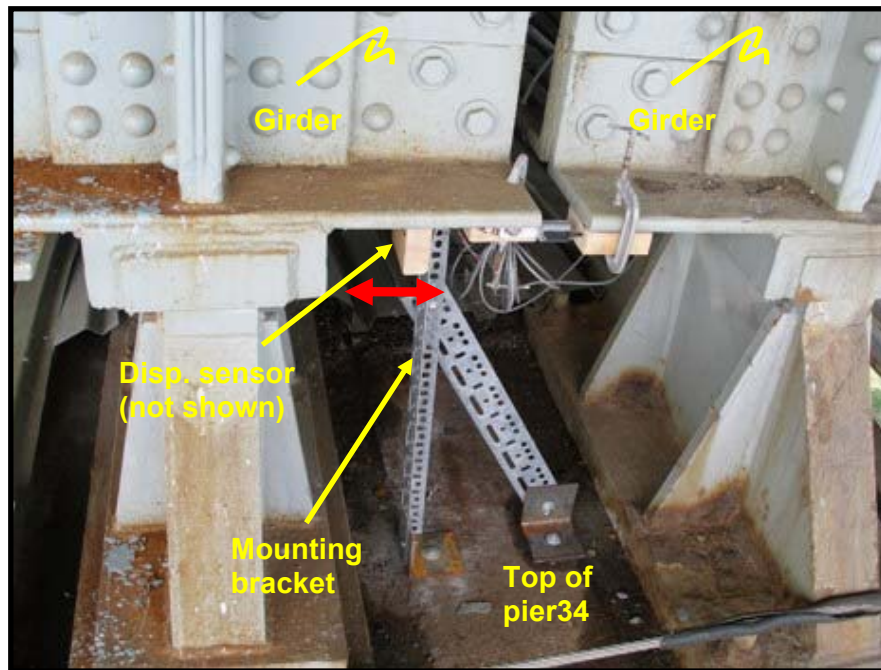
CH_36 installed in Span 35 to measure the relative displacement between Pier 34 and the east girder
